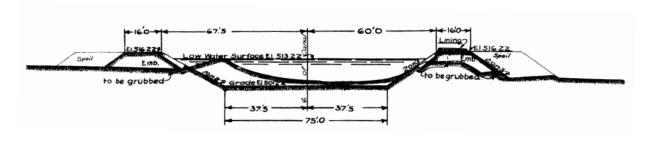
Overbuilt Canal Embankment Section – 60 Mile Pool
